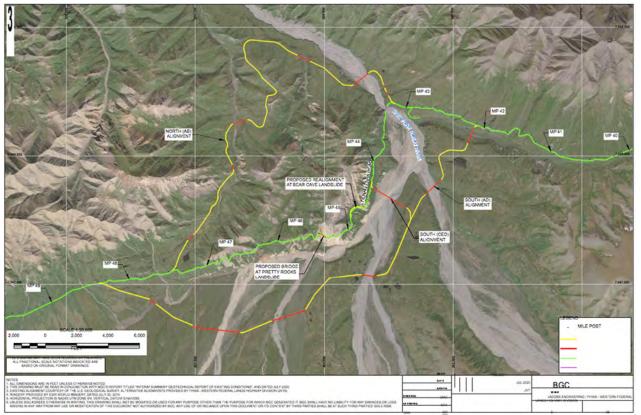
Aerial Photo showing Polychrome Area of the Denali Park Road
